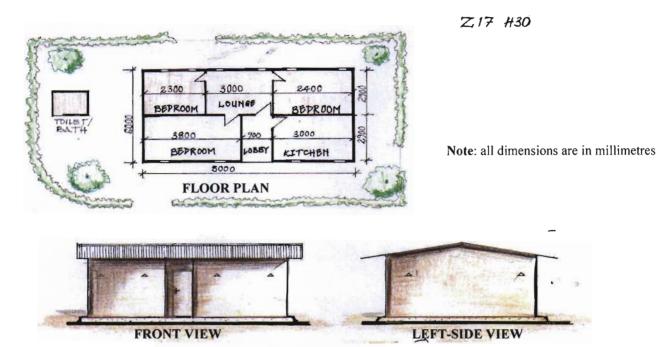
Sketch plan, front and left-side views of House No. Z17-30, Kamatipa, Kitwe (source: author 2005)
